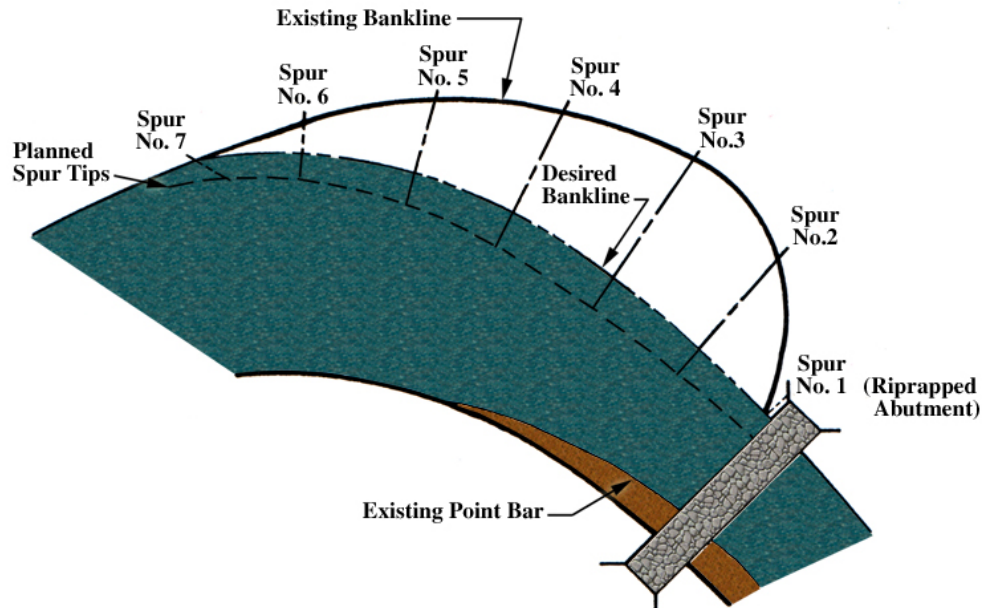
Riprap Spur Location Plan For Reestablishing A Bankline.
